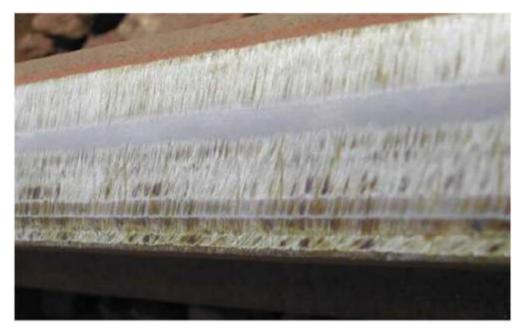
Poor surface finish after grinding – skipped grinding
